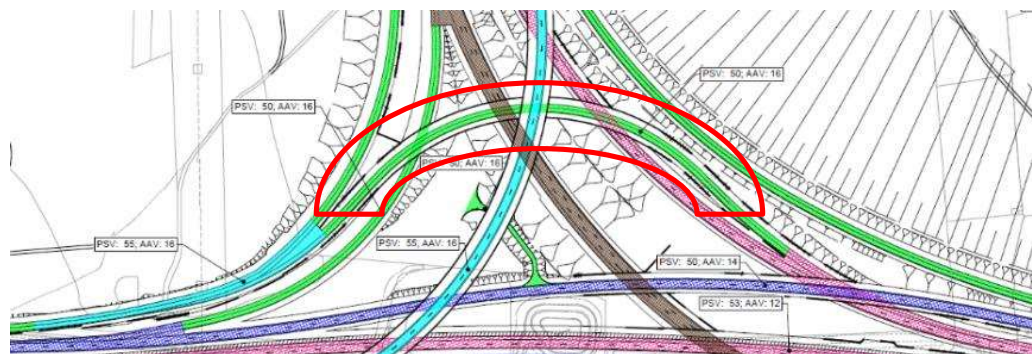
EXTRACT FROM PAVEMENT PSV DRAWING HE540039-CJV-HPV-SSP_ML000000_Z-DR-CH-00023 SHOWING THE CONNECTING LINK BETWEEN THE GRAVESEND LOCAL ROAD AND THE A2 EASTBOUND
